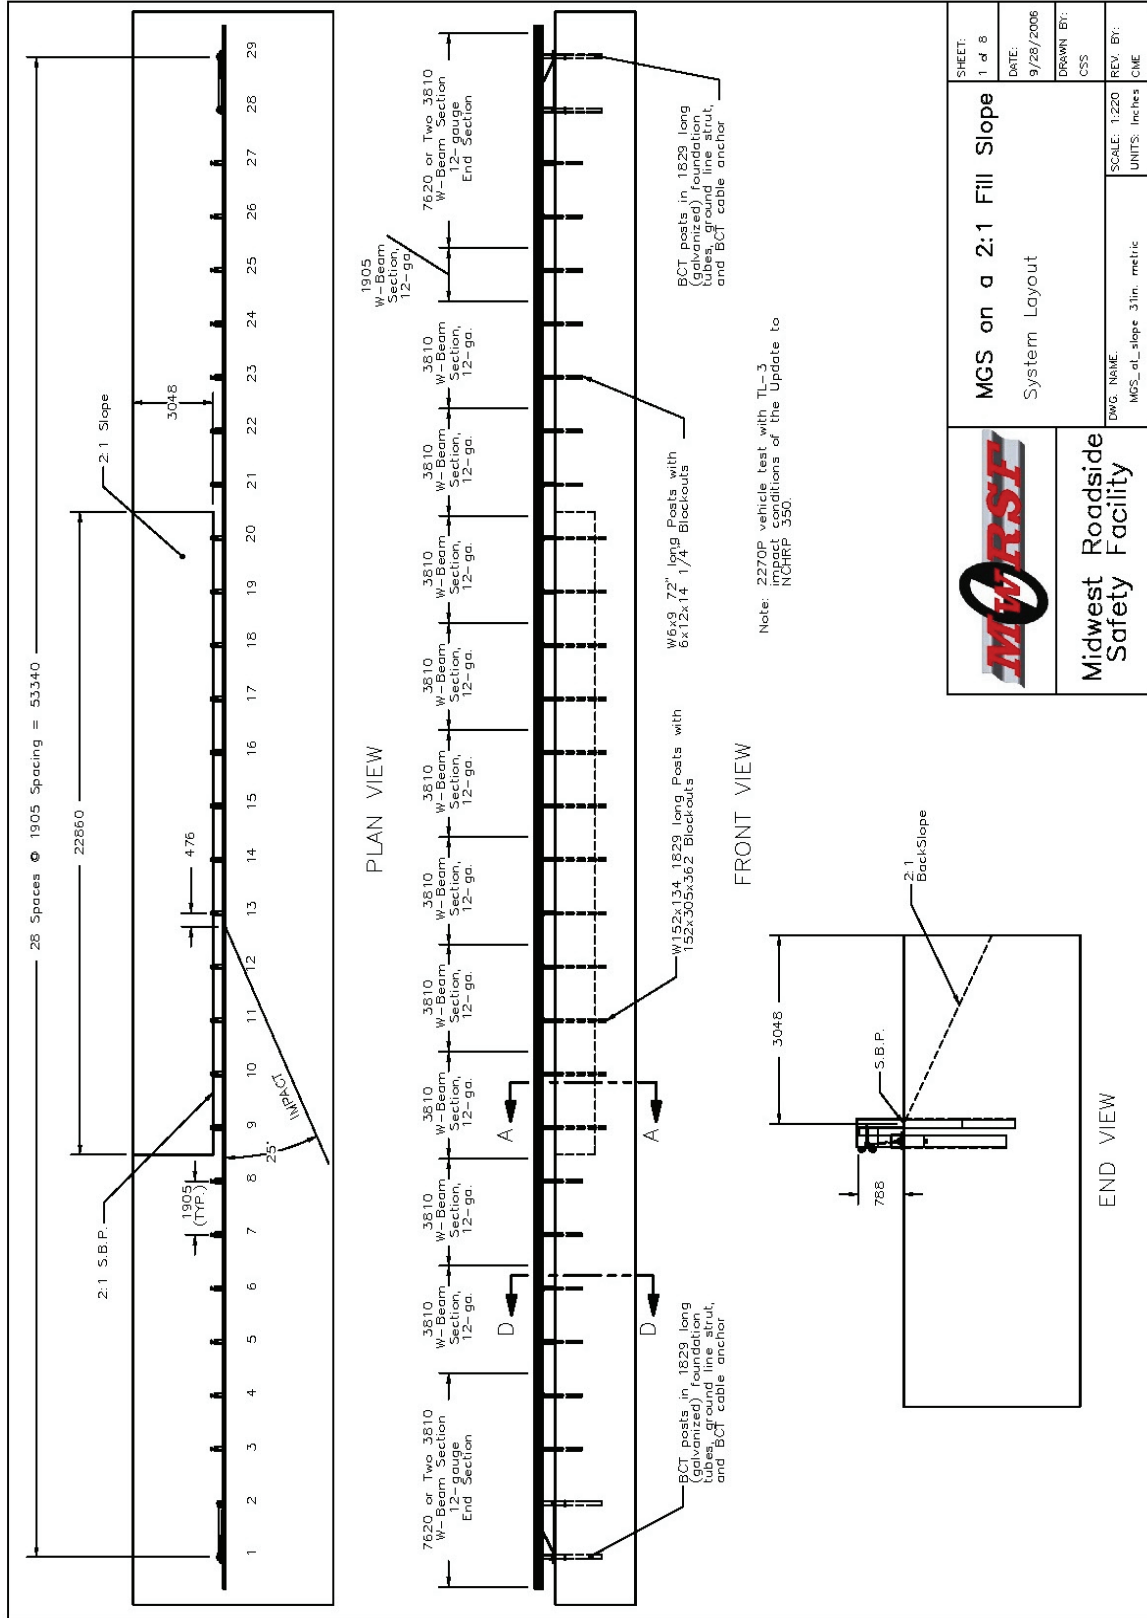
System Layout Details, Test No. MGS221-2 (Metric)
